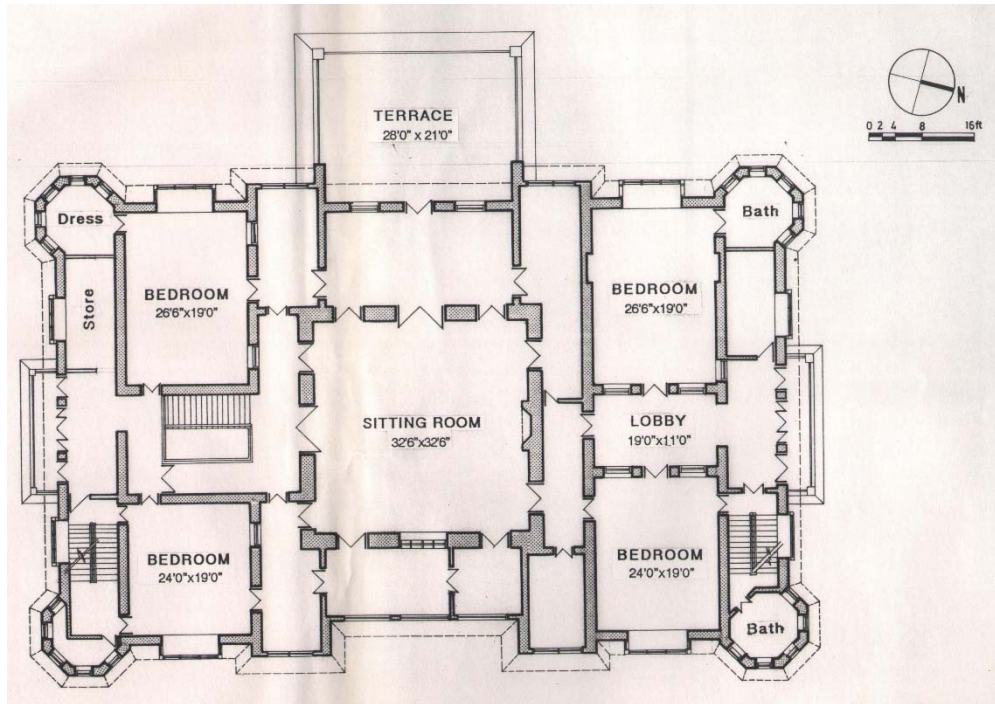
First Floor Plan of Mohatta Palace. Courtesy to Copyright © 2016 Heritage Foundation of Pakistan
